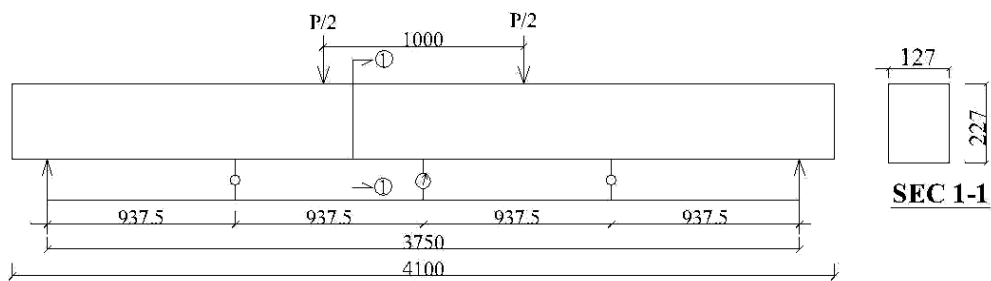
Longitudinal and Cross-Section of Retrofitted Beams
